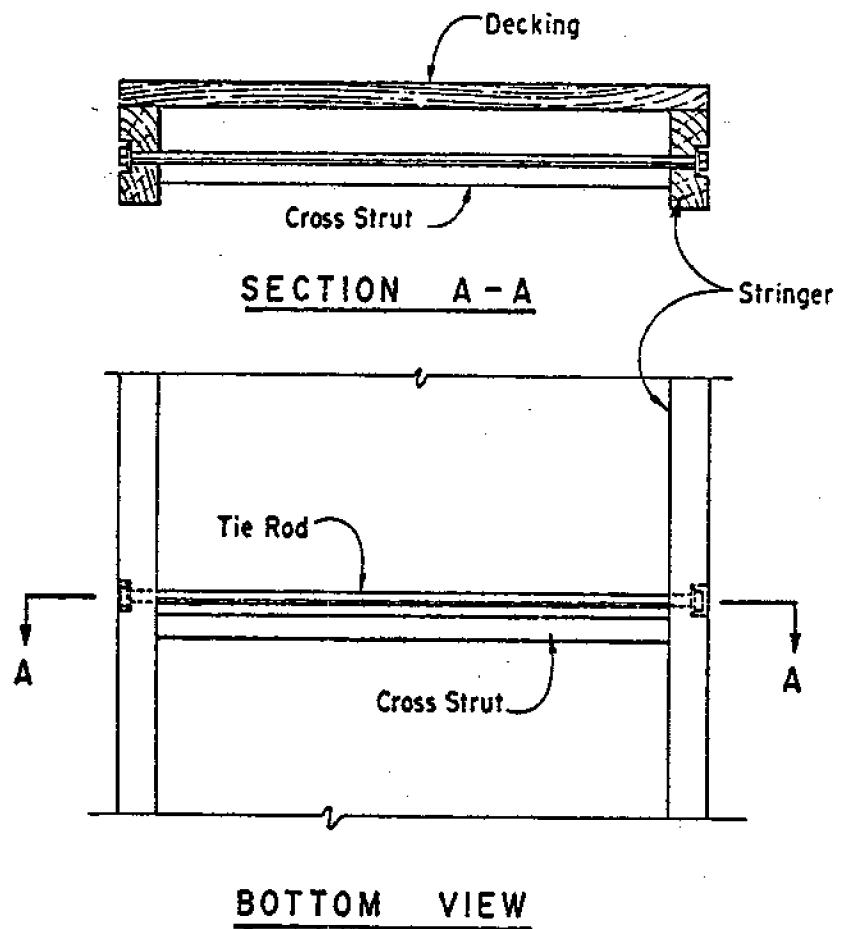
Crossties and Struts Used to Strengthen Floating Pier Decks (Dunham and Finn, 1974, p. 149)
